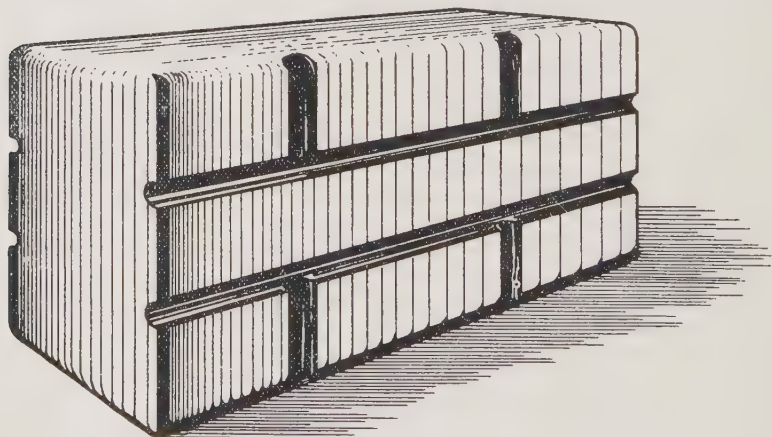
Grooved paving block. Drawing by L. W. Kesler.
